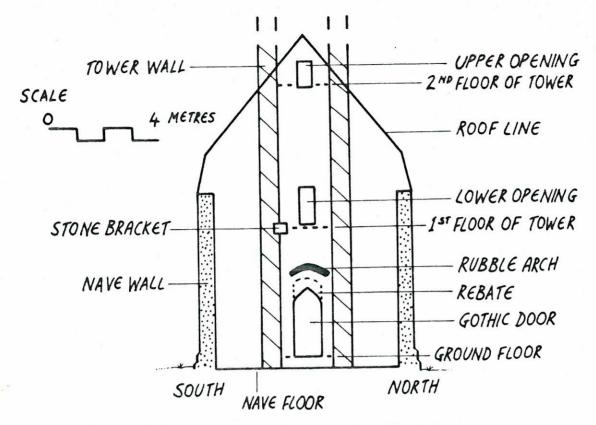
St Mary, Sedgeberrow: elevation of the west wall of the nave.
